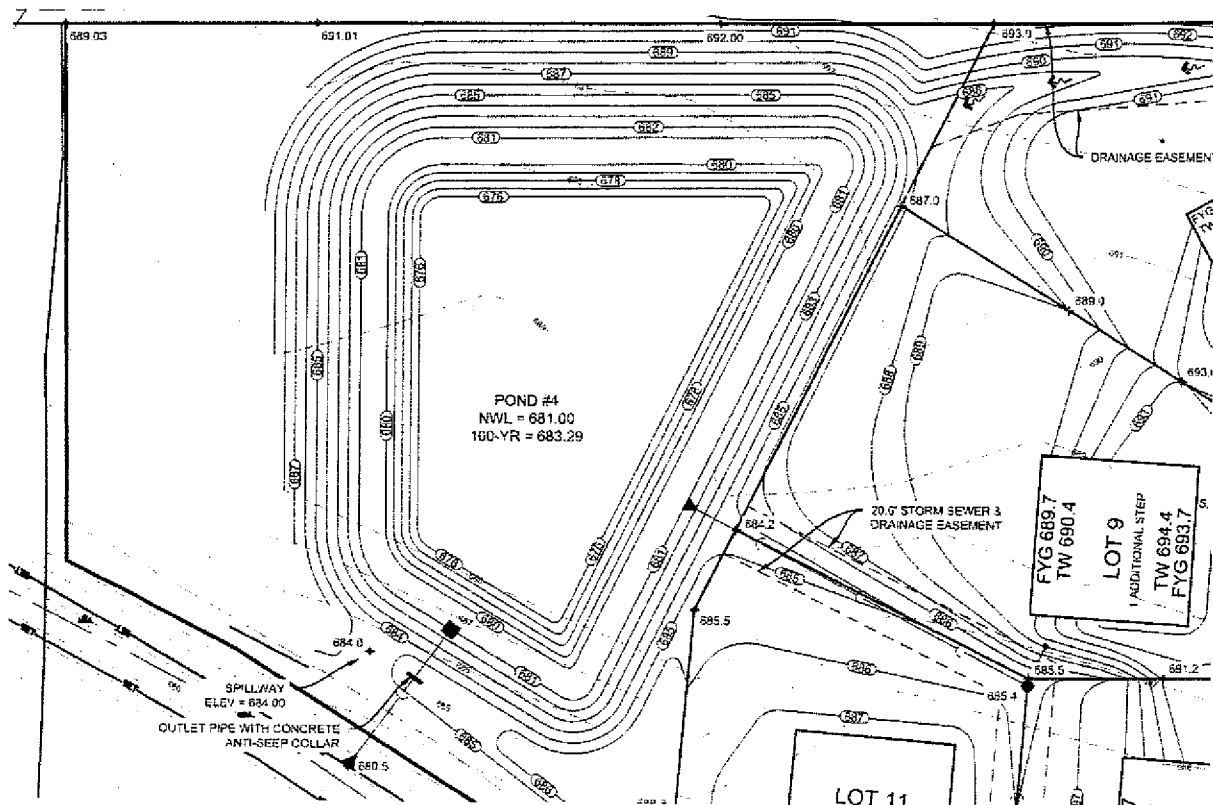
Exhibit B – Wet Pond Overall Drainage & Grading Plan
